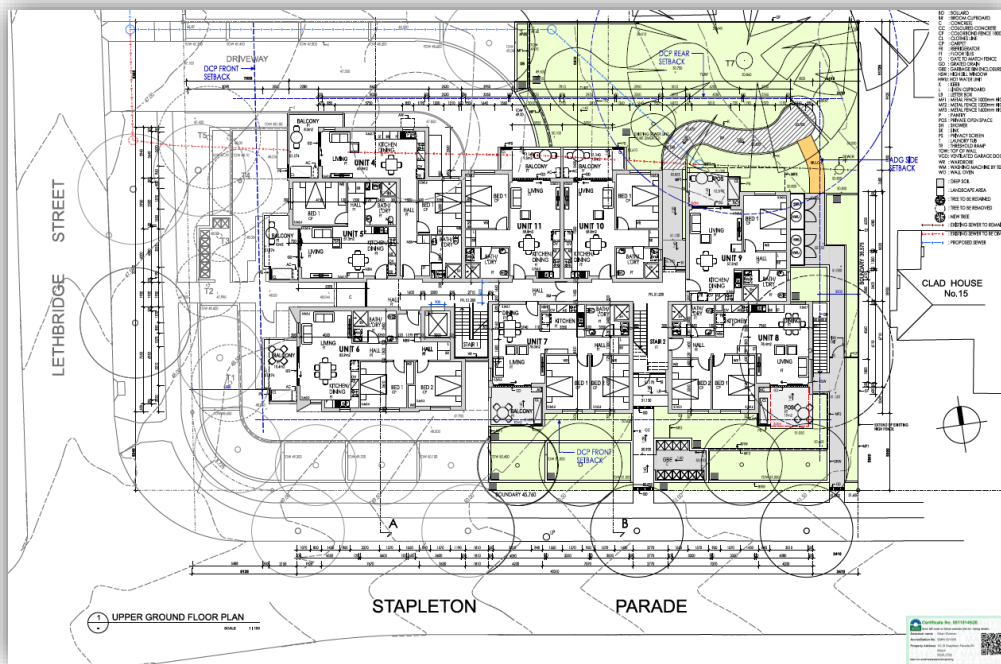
Extract from Architectural Plans – Upper Ground Floor (Source: DKT Architects, September 2024)
